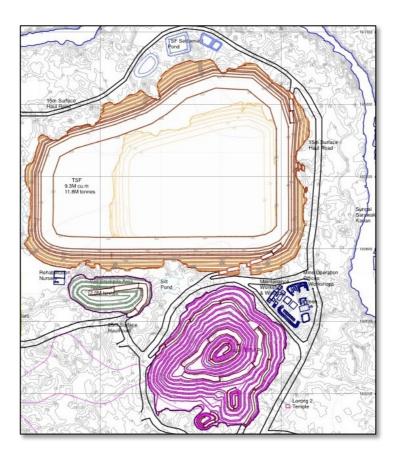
Proposed Jugan Tailings Impoundment Design in Relation to Pit
